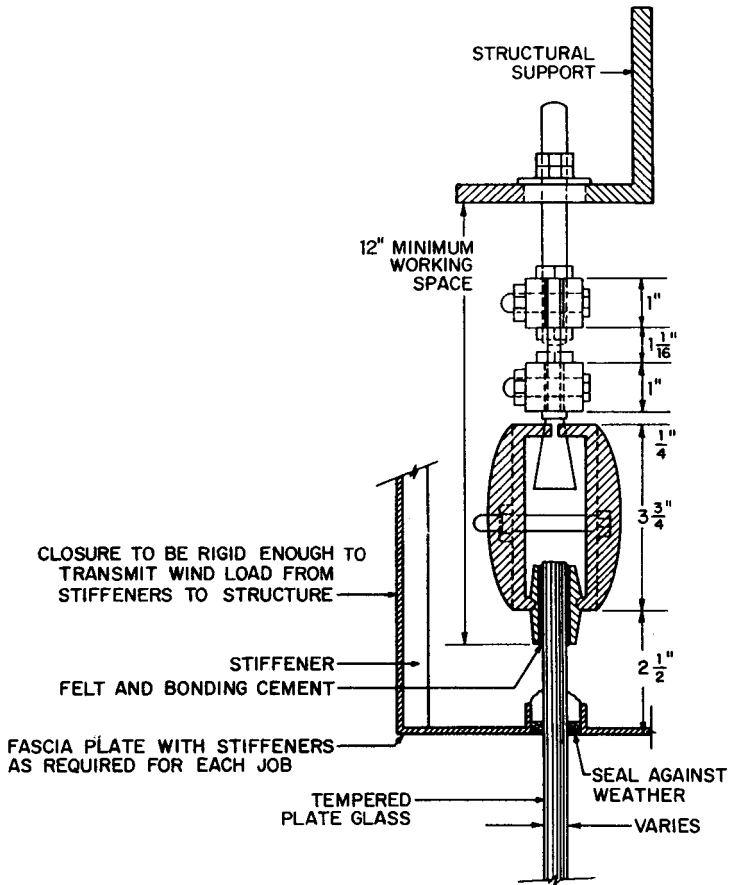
Typical details of suspended glazing. (F. H. Sparks, Co., Inc., New York.)
